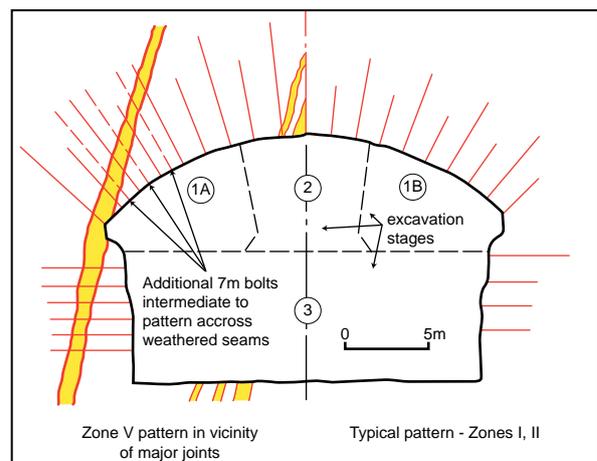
Typical cavern sections, excavation stages and rock reinforcement (after Sharp et al., 1986)
